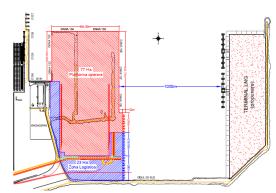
The general plan of the container terminals MOL IIIS and MOL IVS (source: Master Plan Port of Constanța, Final report, December 2016, Ernst & Young SRL -INROS LACKNER SE)
